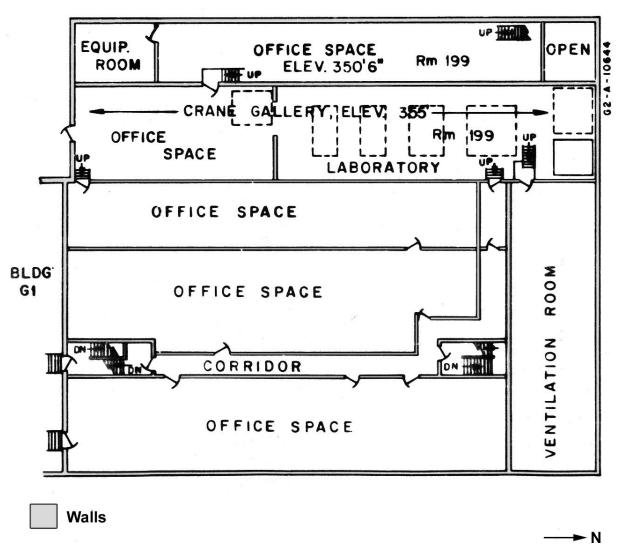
Building G2, 3rd Floor, 357-Foot Level, (modified from Drawing No. G2-A-10644, February 17, 1984; approximate 2004 configuration)
